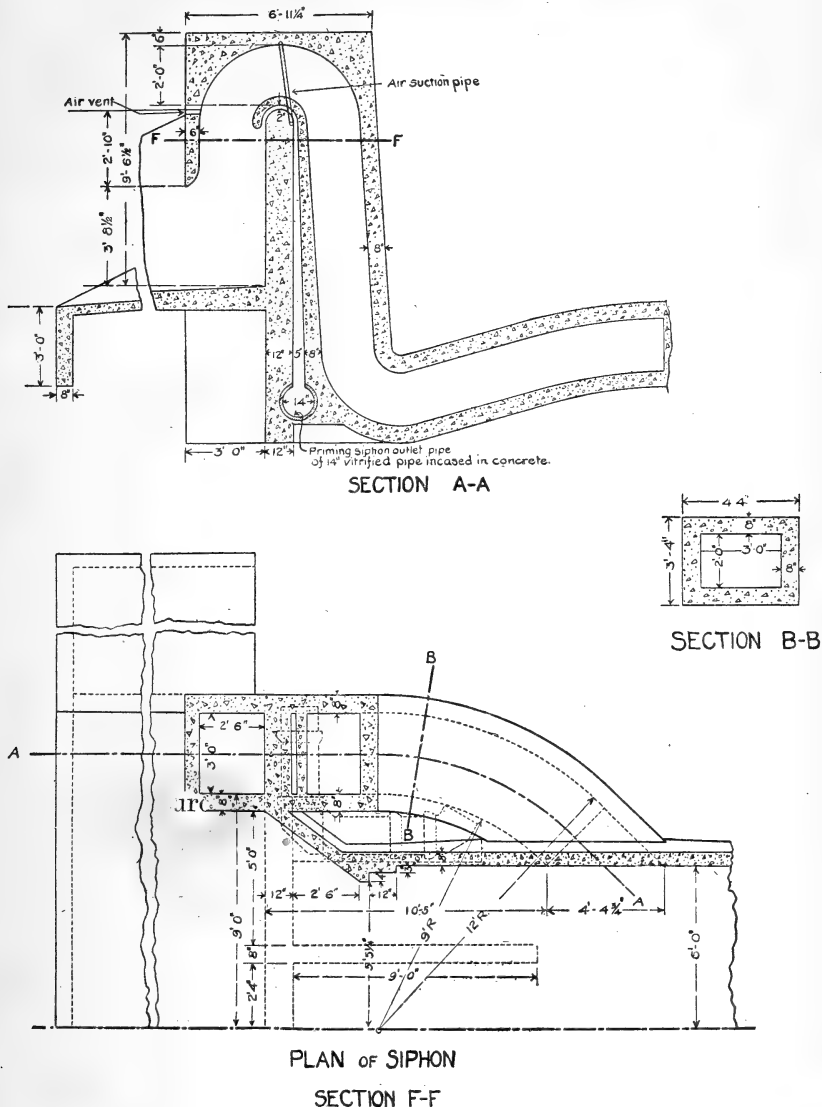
Cross-section and section plan of siphon spillway. South San Joaquin irrigation district, Ripon, Calif.
